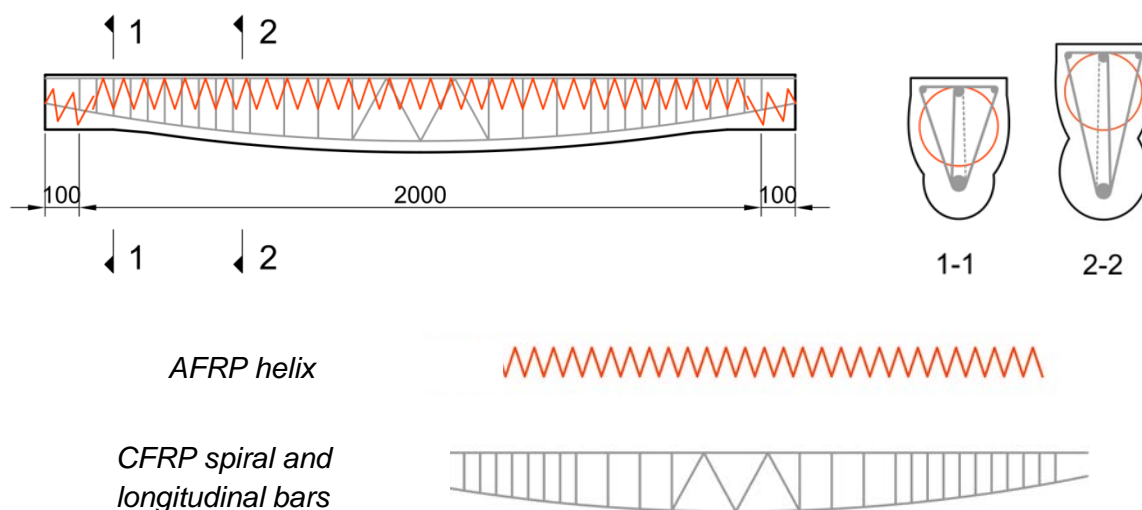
Case study 1 reinforcement details (all dimensions are in millimetres)
